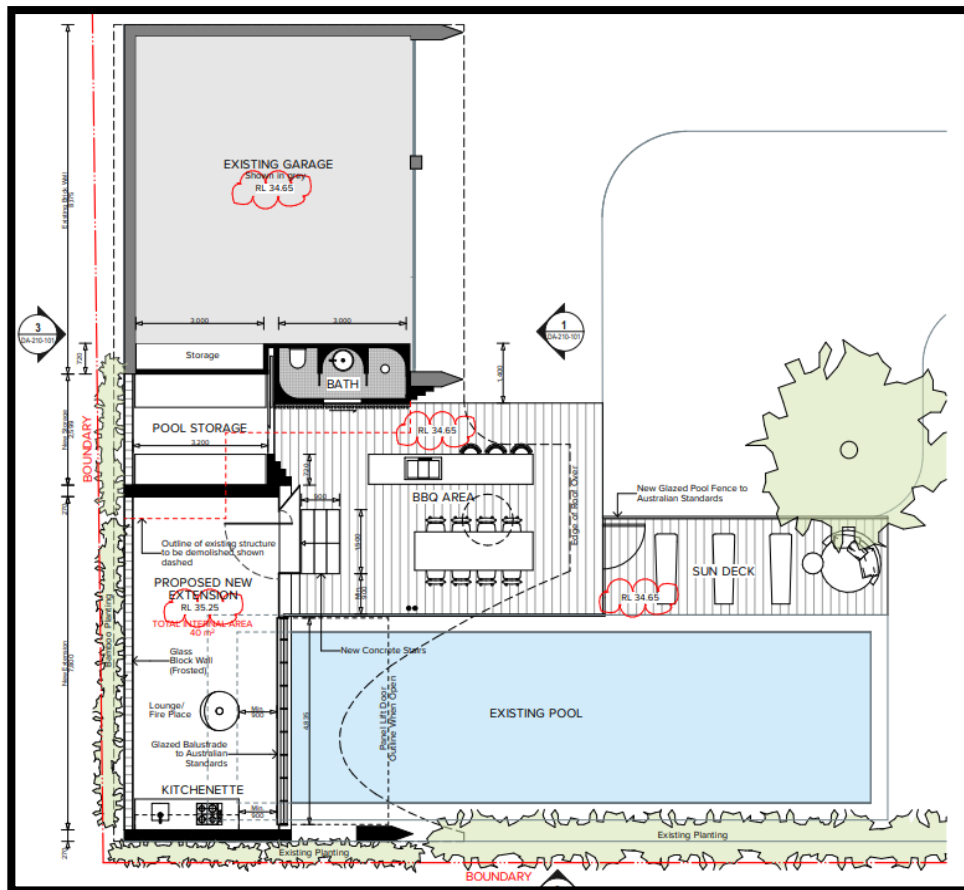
Proposed new layout of the cabana, external bathroom and storage.
